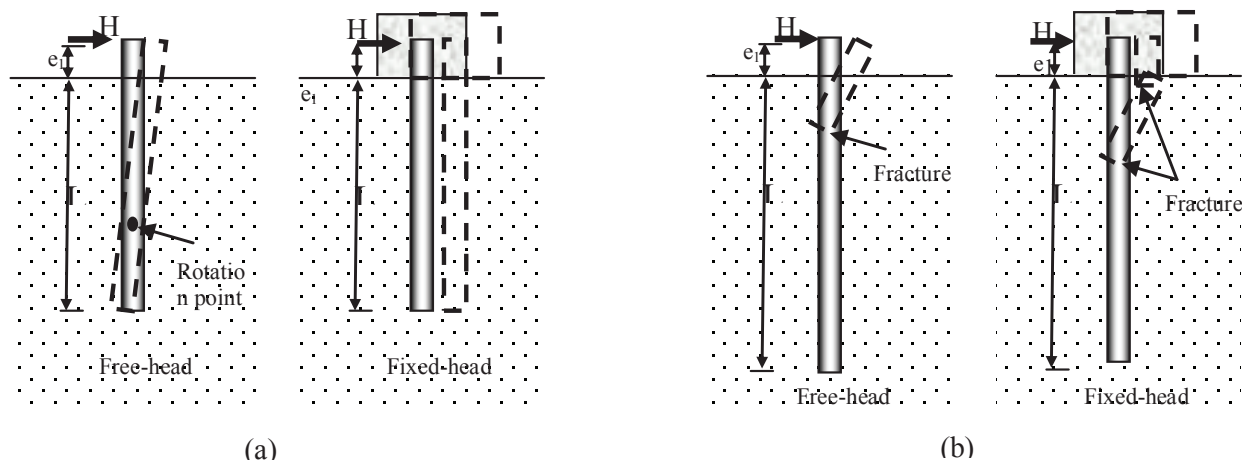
Failure modes of vertical pile under lateral load (Broms, 1964a&b): (a) short pile under lateral load and (b) long pile under lateral load.
